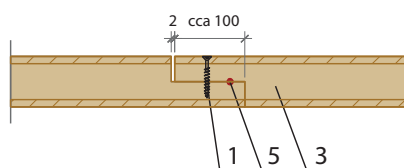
DETAIL OF A LONGITUDINAL JUNCTION 62 – WITH FASTENER
